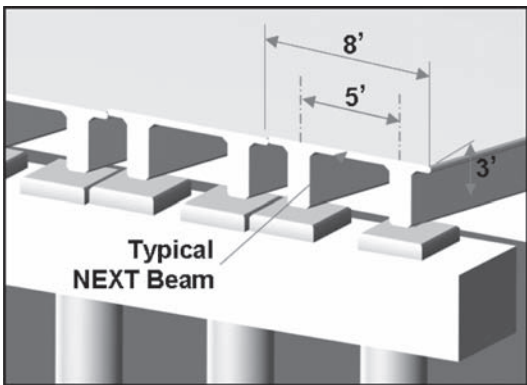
Northeast Extreme Tee Beam (NEXT Beam)—Proposed Section.
